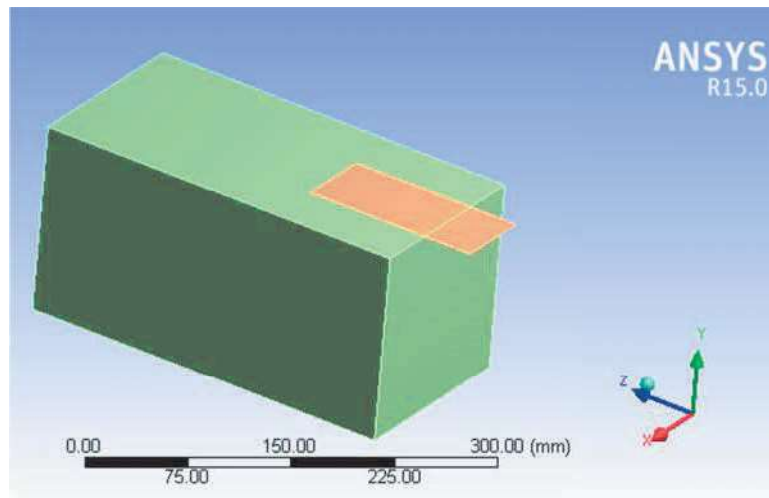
Concrete Specimen with Bonded GFRP (100 mm)
